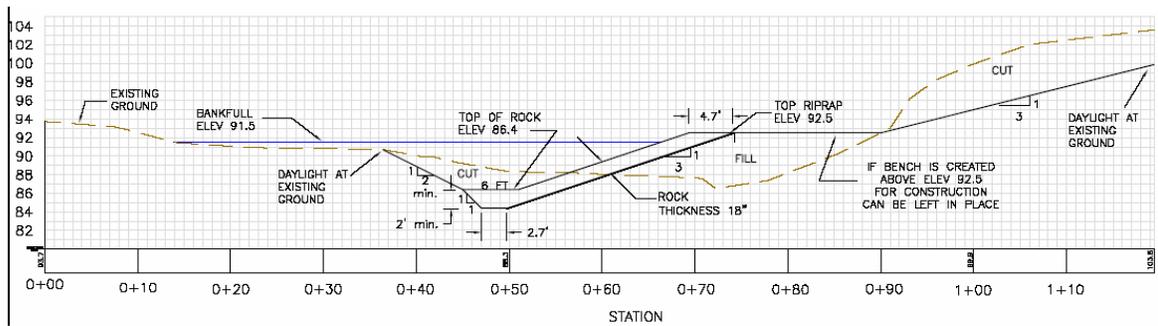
Stream cross-section showing proposed riprap downstream of crossing (looking downstream)
